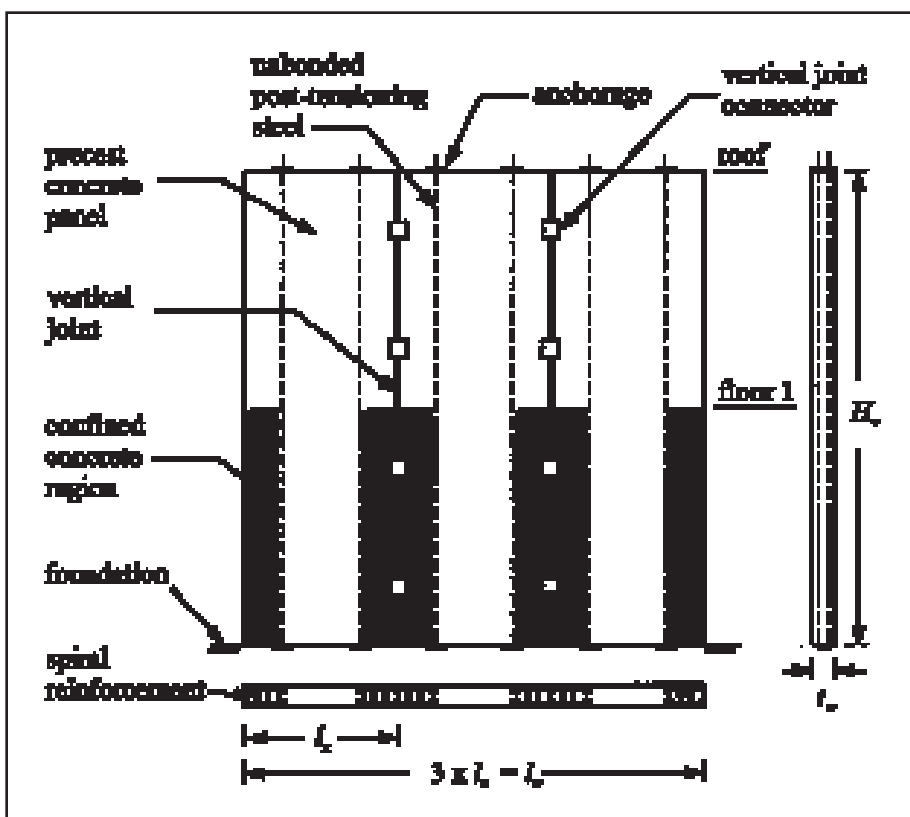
Precast wall with vertical joints between panels and vertical joint connectors.
